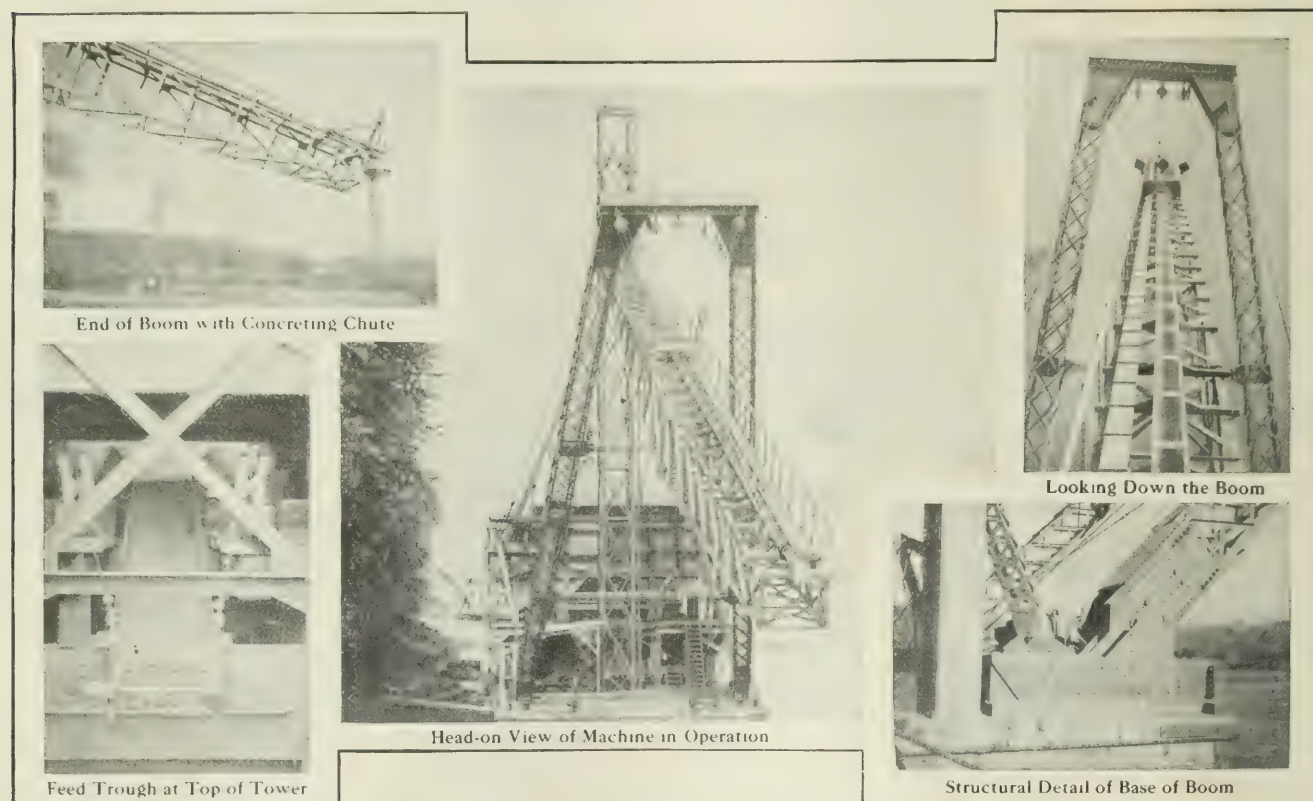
DETAIL VIEWS OF THE OHIO RIVER LOCK AND DAM CONCRETE-MIXER BOAT
